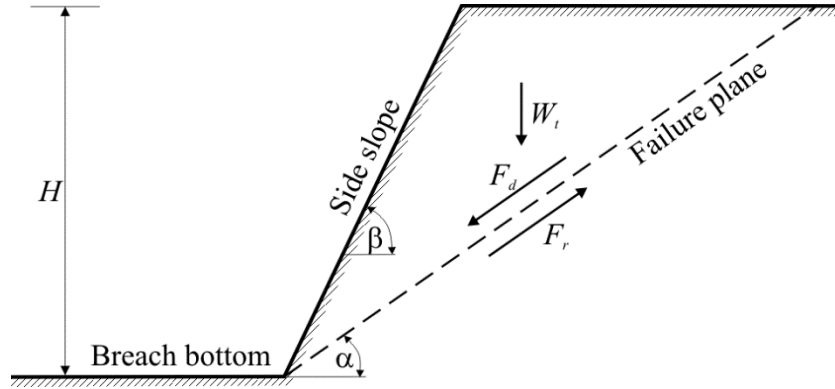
Breach Slope Mass Failure: Planar Failure
